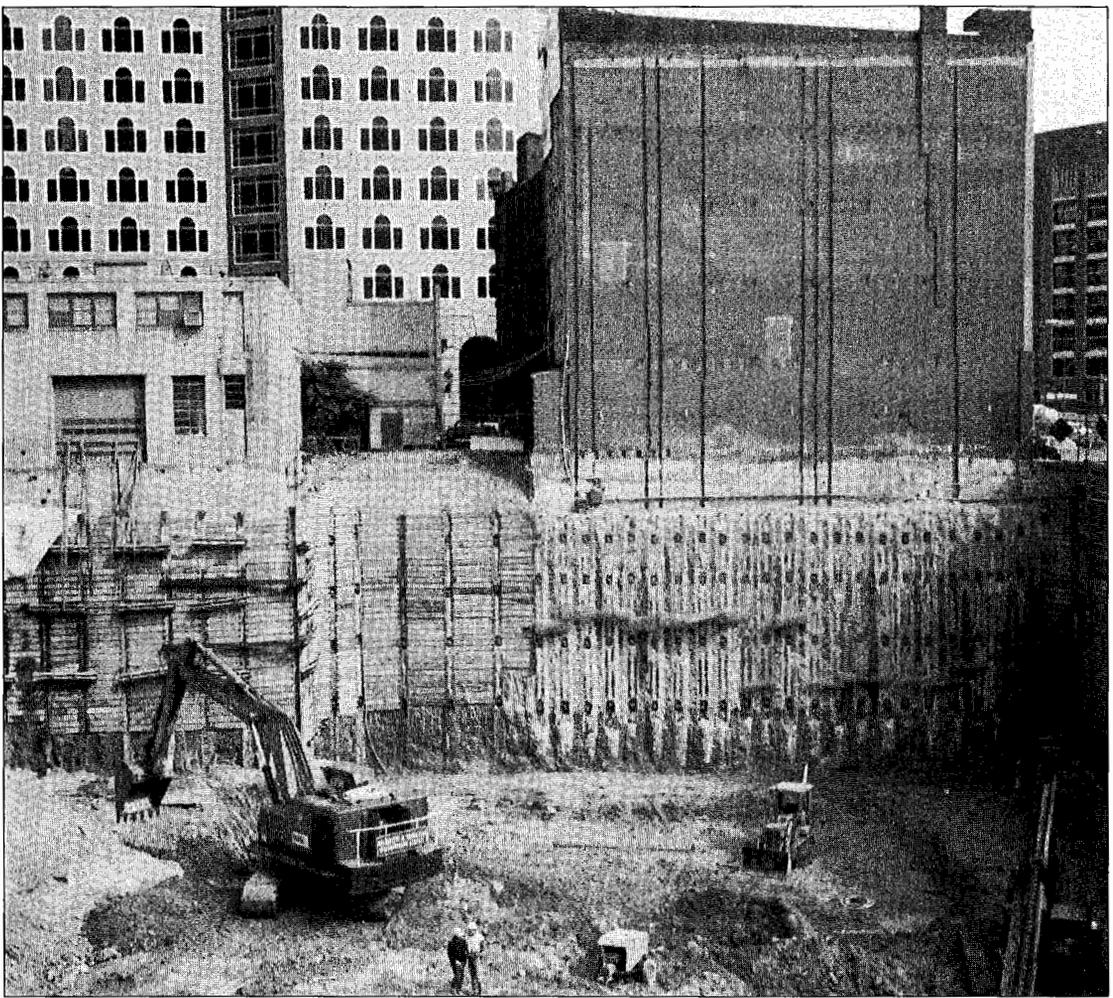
A view of the brownstone building abutting the 125 High Street excavation.
